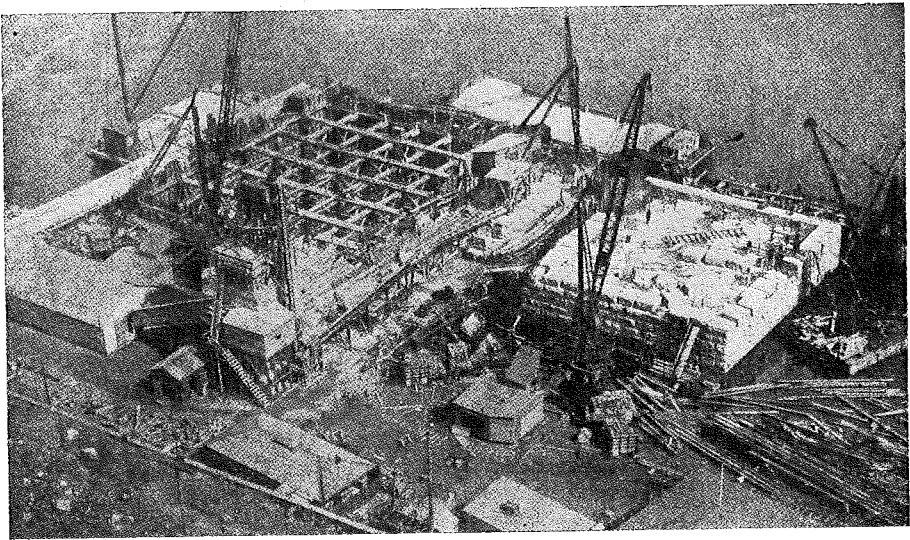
COFFERDAM FOR A PIER OF THE NEW JERSEY TOWER, GEORGE WASHINGTON BRIDGE.
